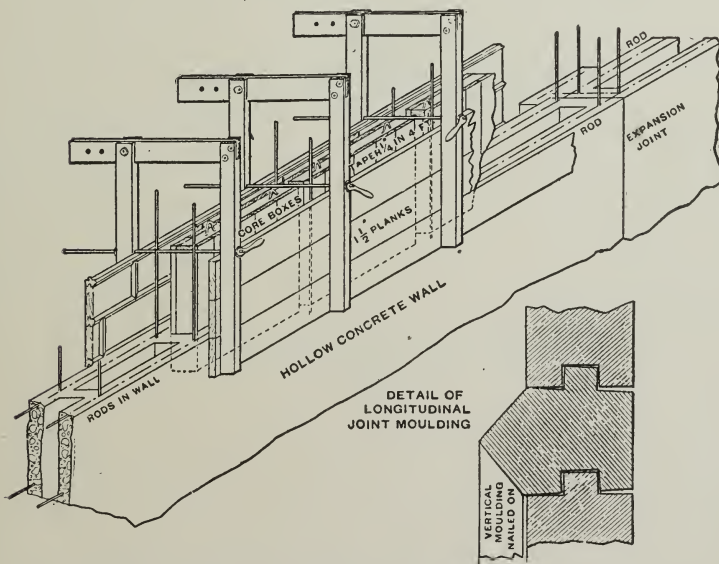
Wood Forms for Hollow Outside Concrete Wall.
